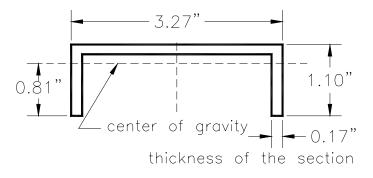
Channel Section Dimensions of Propylene Specimen
